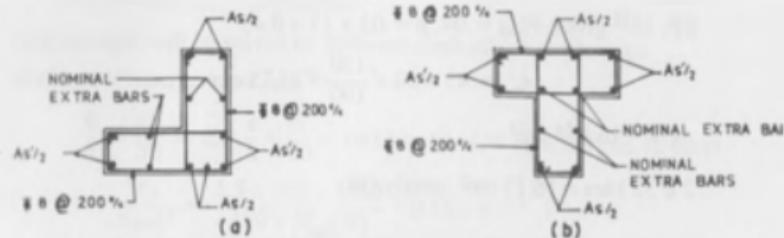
Steel arrangement in columns. (a) L-shaped section; (b) T-shaped section.
